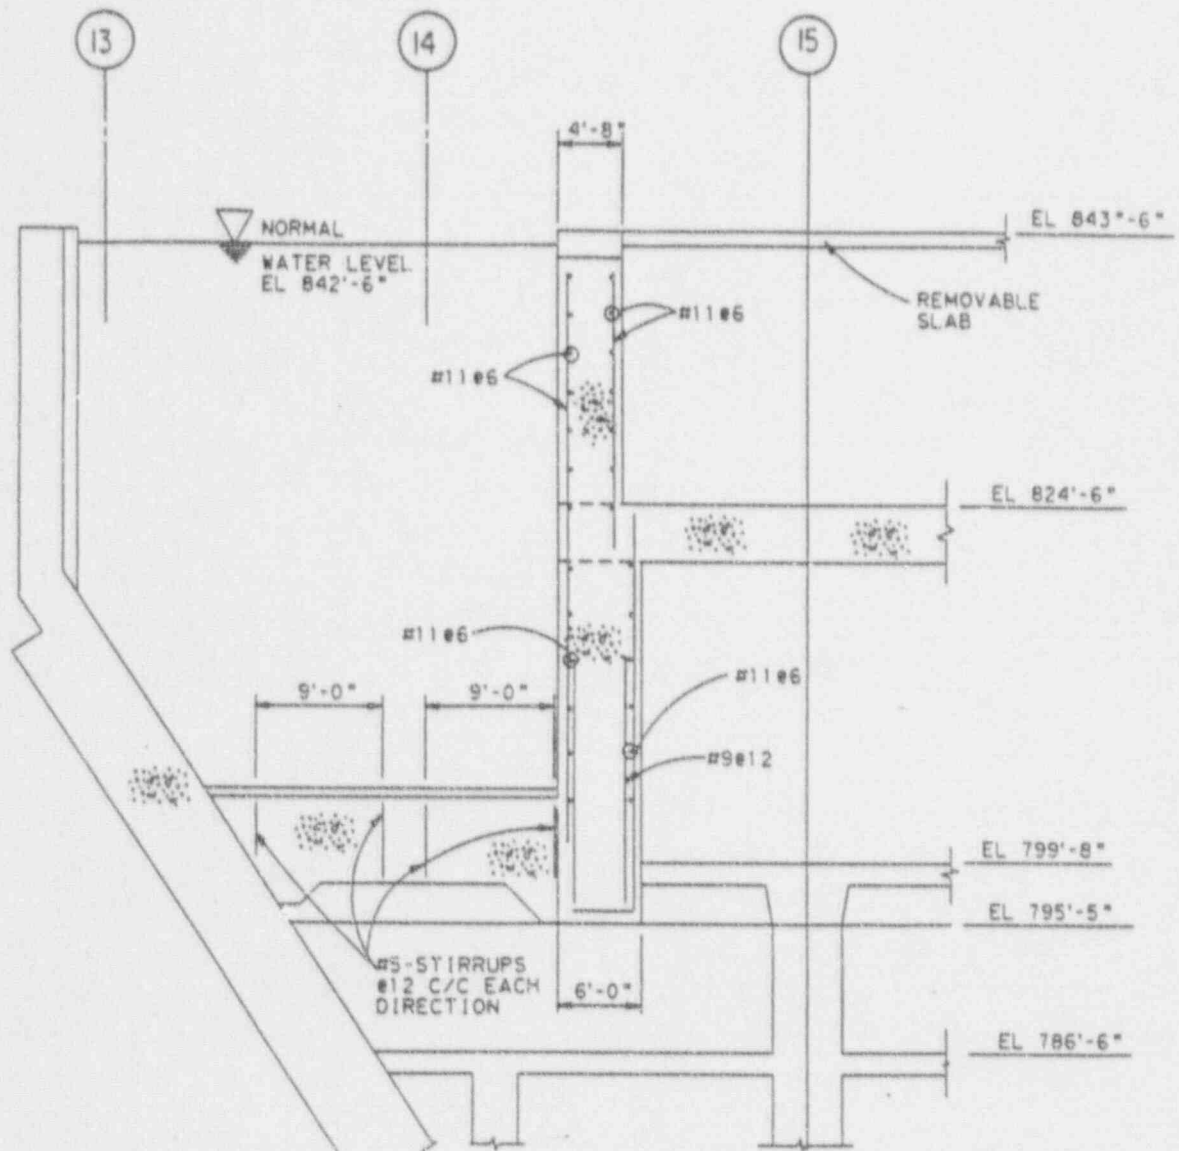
SECTION THROUGH CASK STORAGE AREA LOOKING AT EAST WALL
